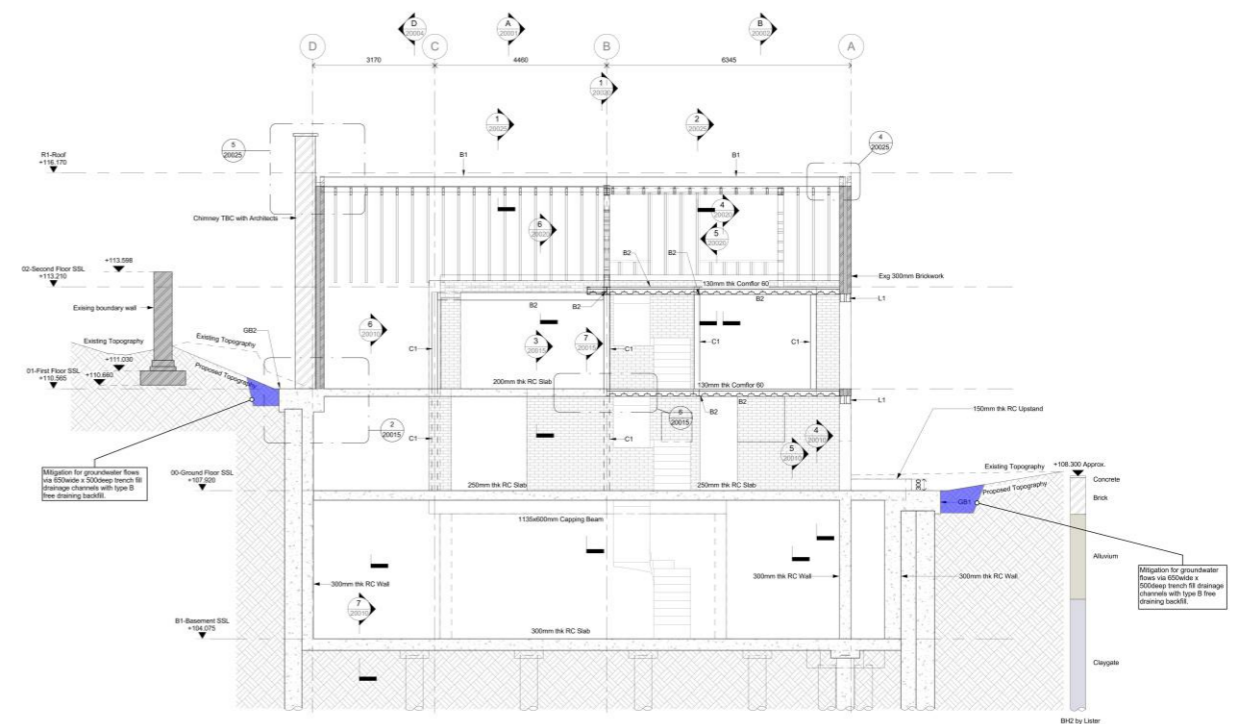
Proposed Drainage Channels in plan and section surrounding the excavation leading towards the east of the site
